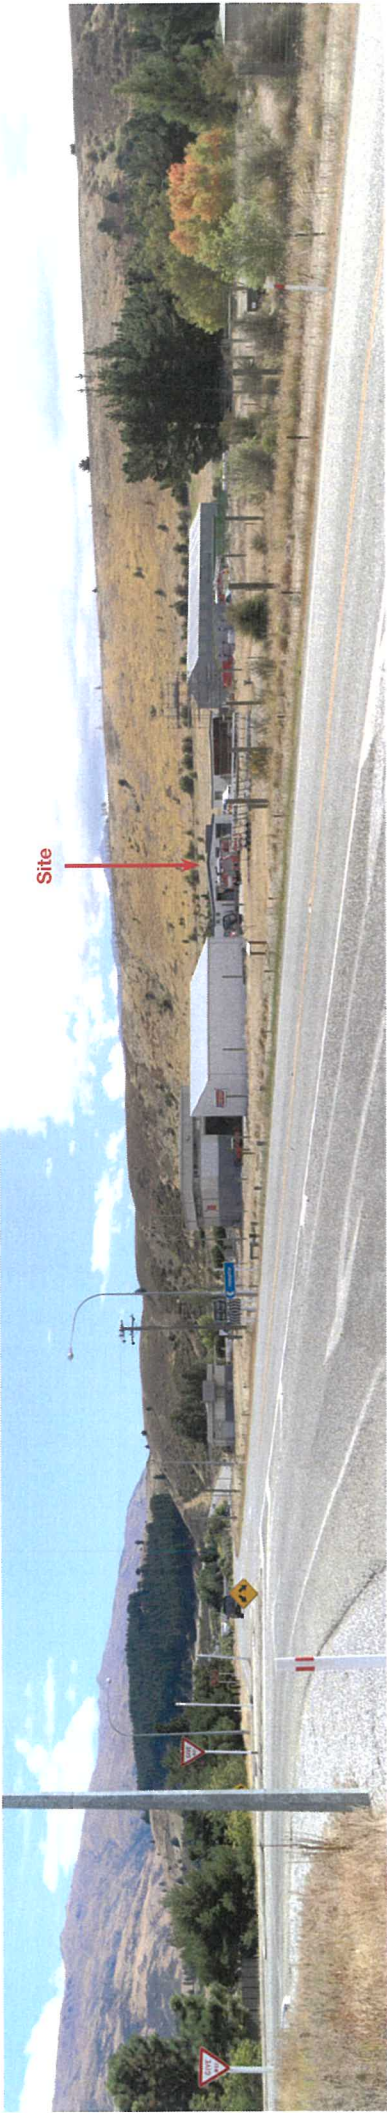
View toward the site from State Highway 8 approx. 550m to the south
